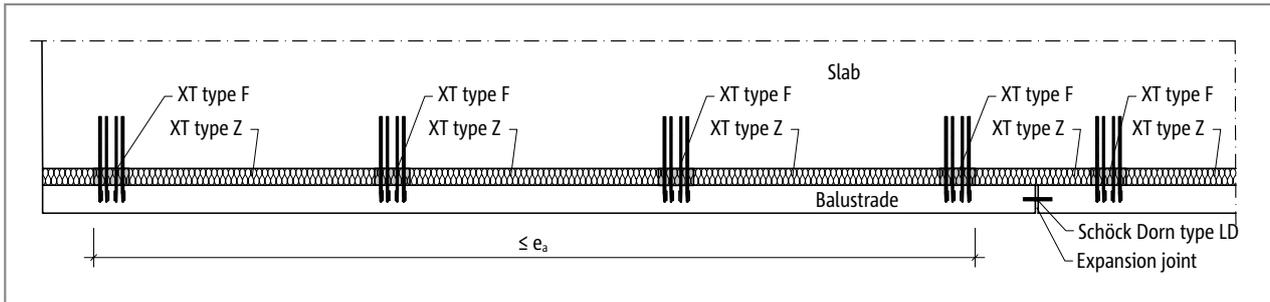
Schöck Isokorb® XT type F: Expansion joint arrangement
